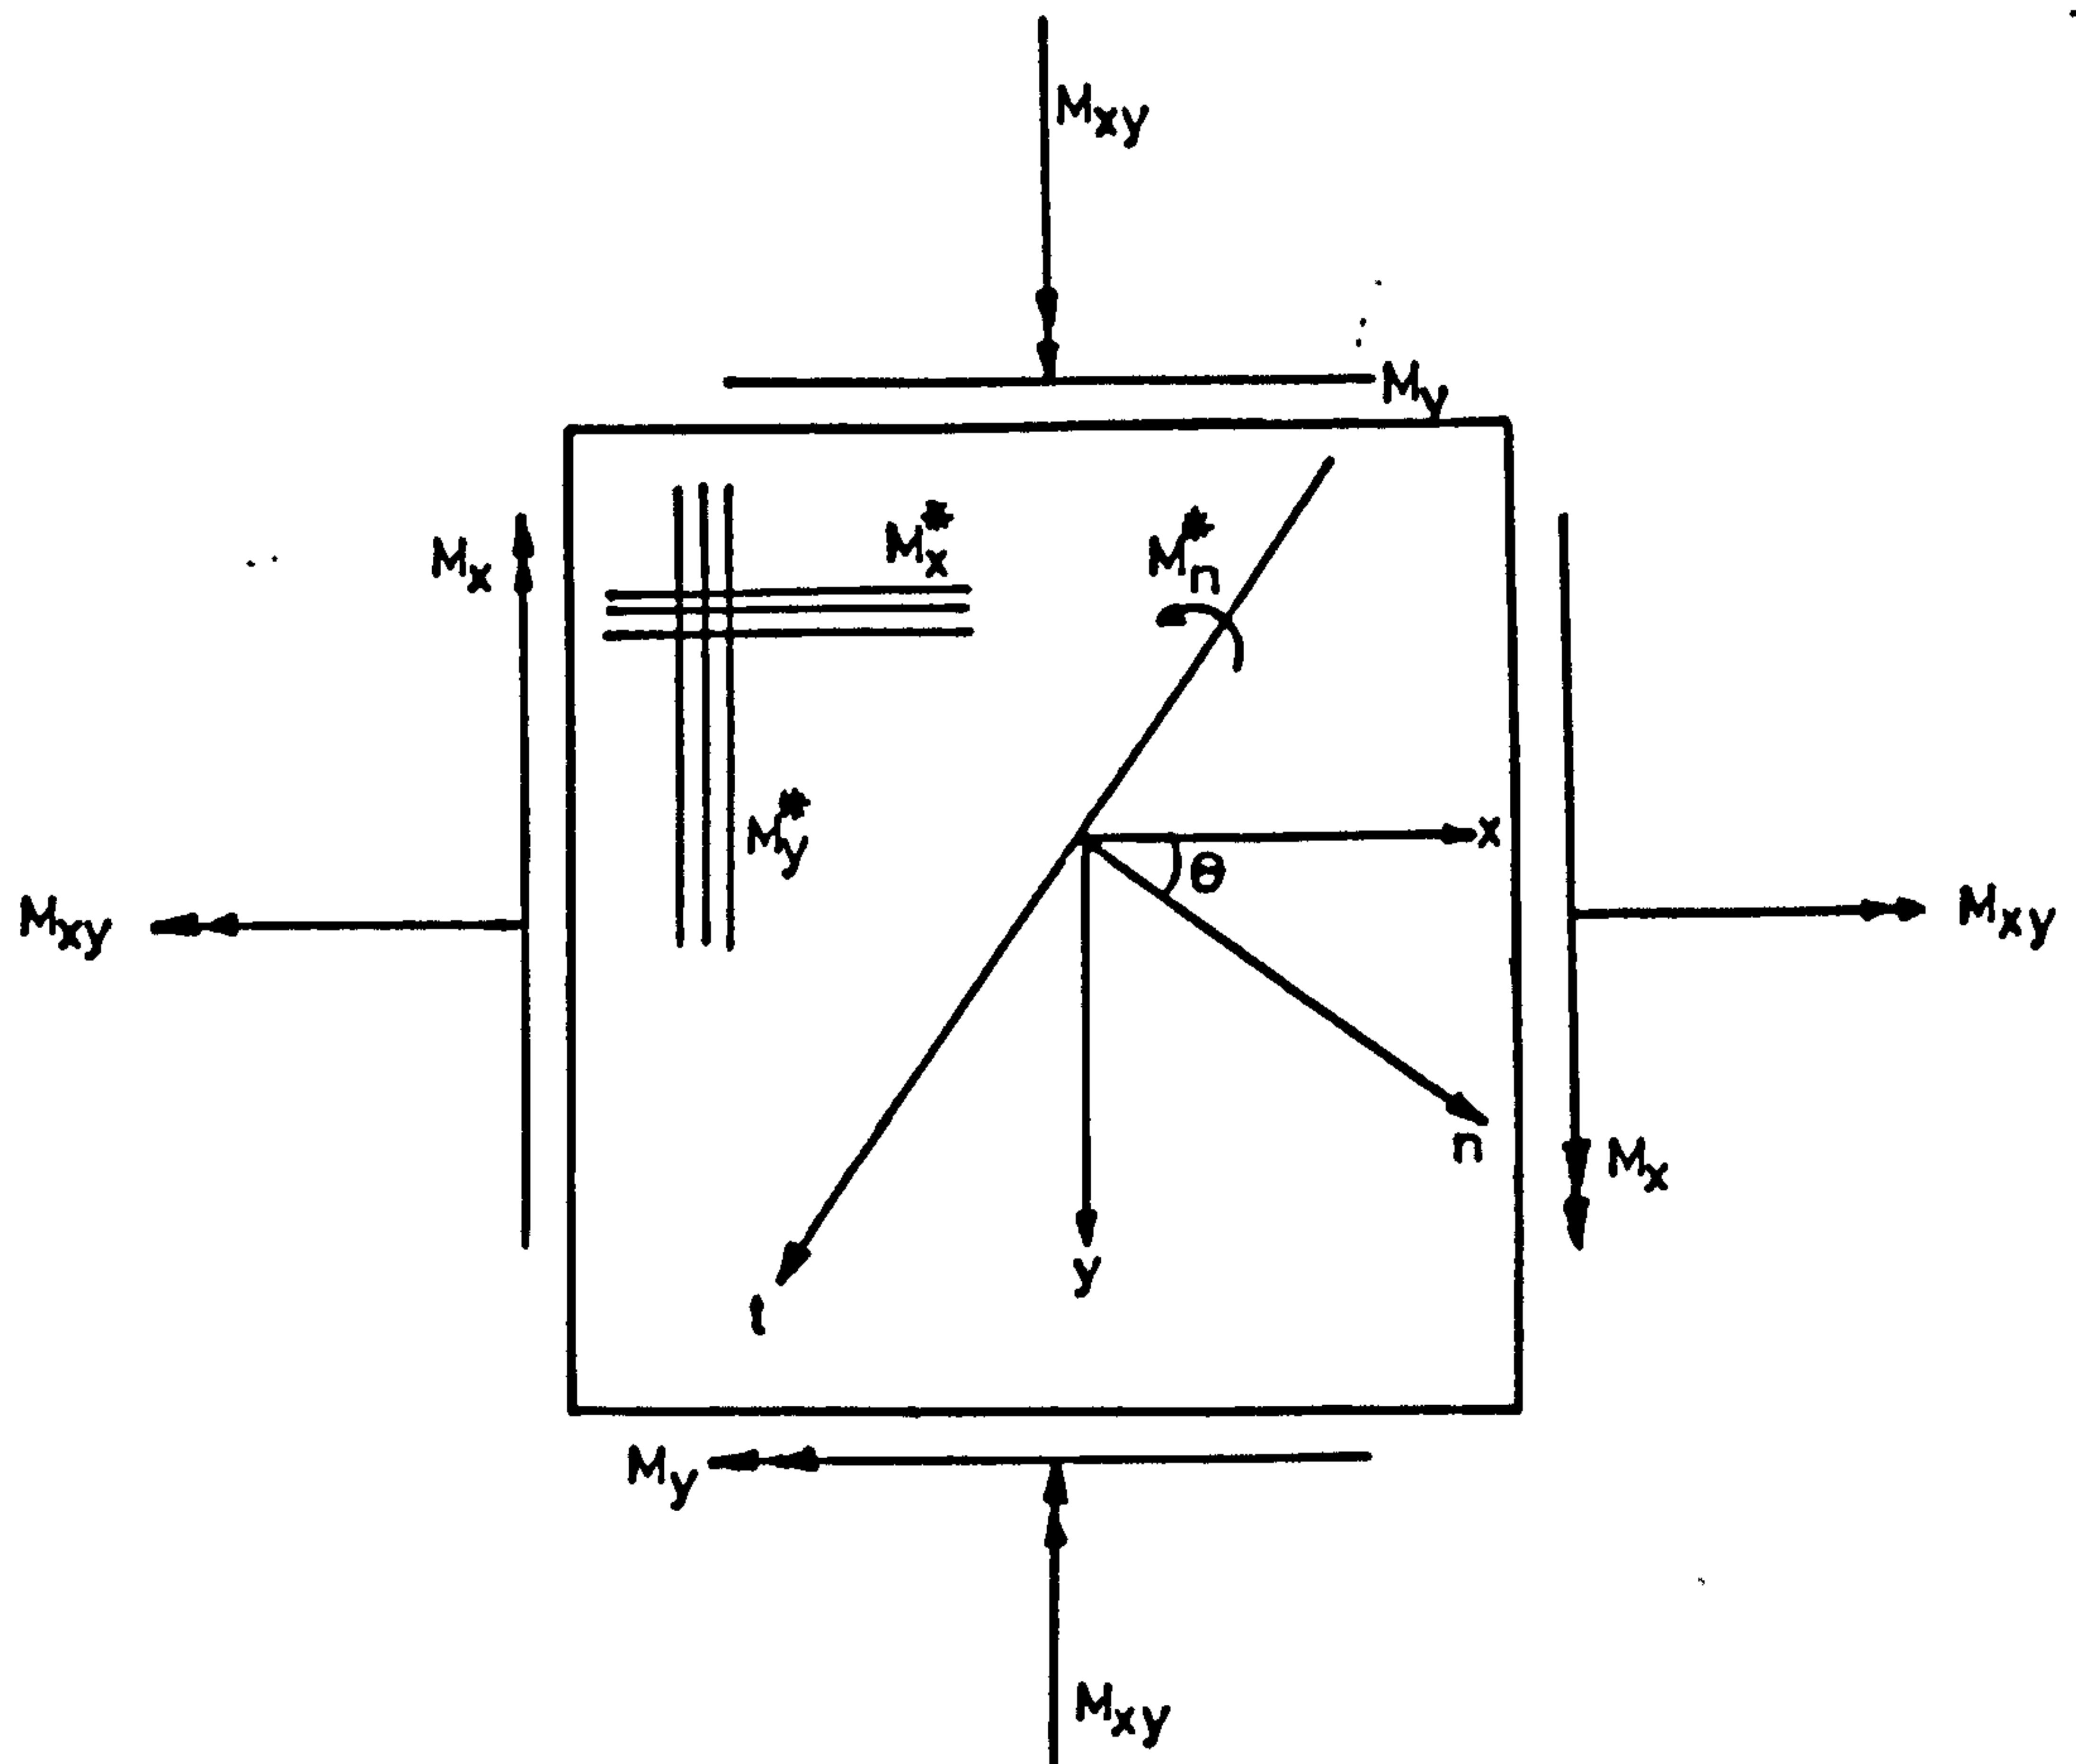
A typical slab element with orthogonal reinforcement.
